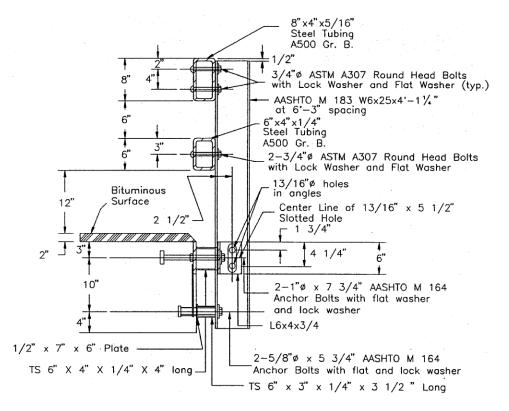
Illinois Side-Mounted Bridge Rail [3]
